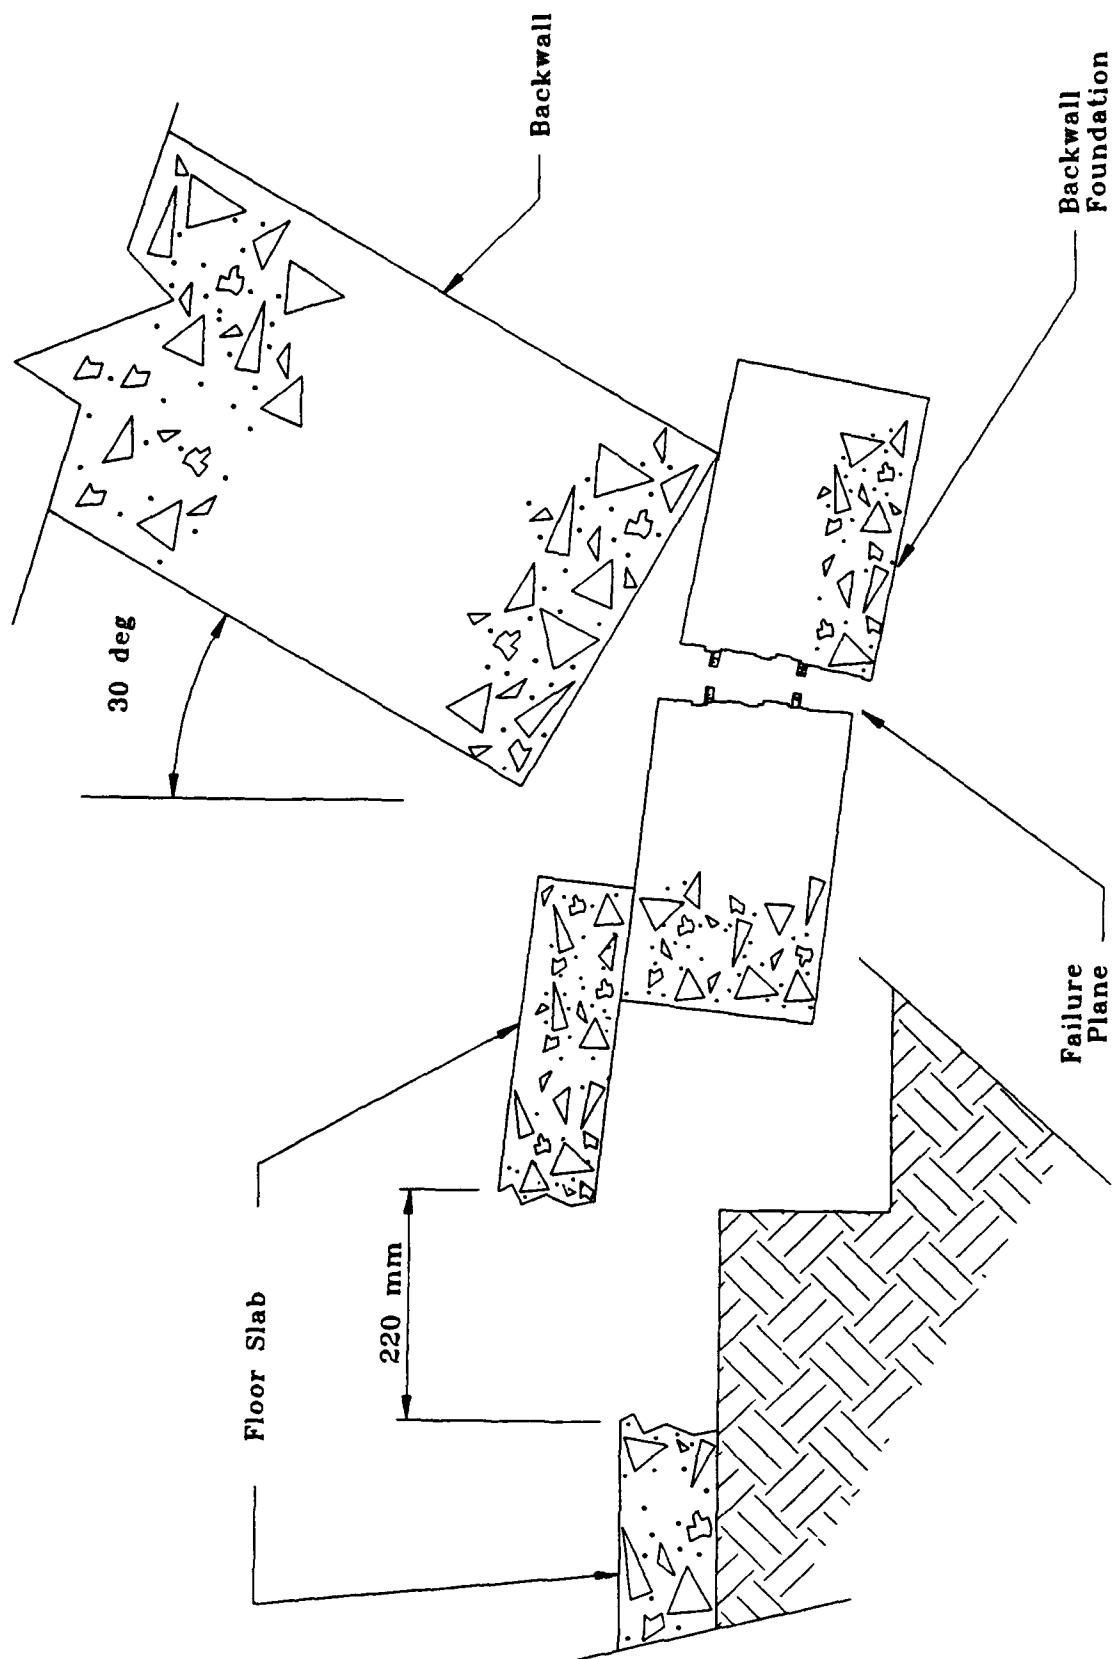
Section: Breakup pattern of backwall foundation, PAS-4.
